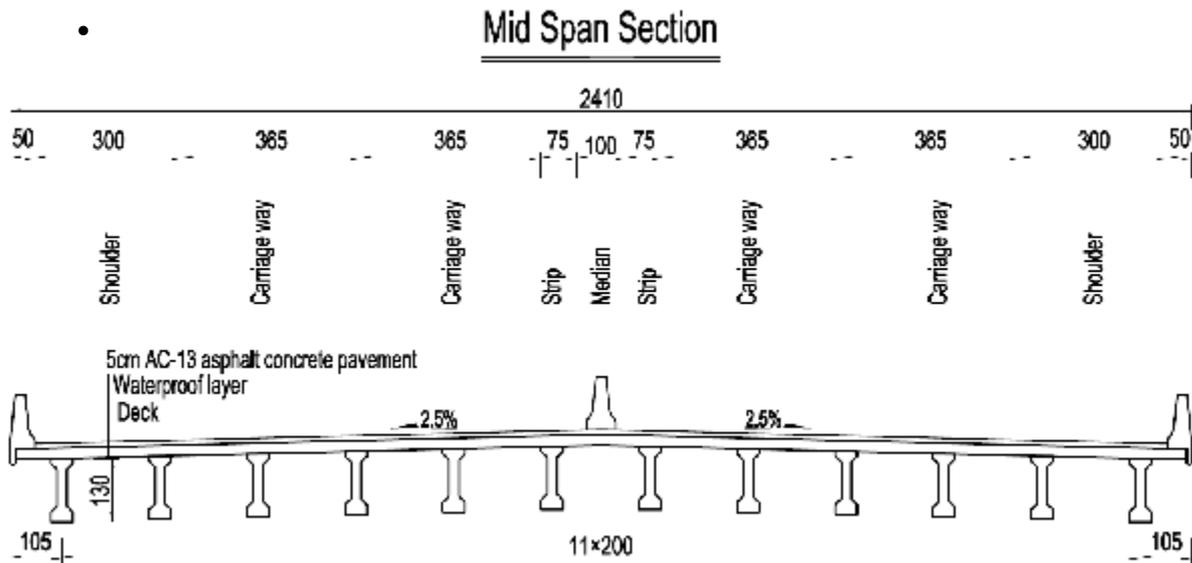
Typical Cross-Section of 20m I-beam on 'Deck-on-Pile' Foundation
